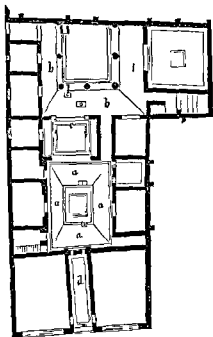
GROUND PLAN OF THE HOUSE OF THE TRAGIC POET, POMPEII.
